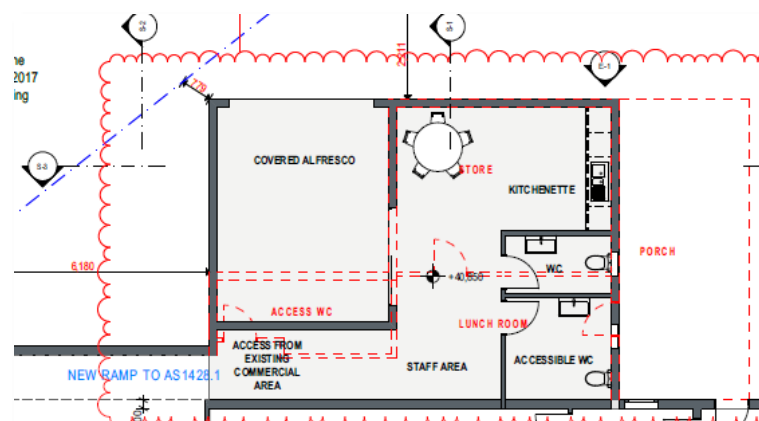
PROPOSED INTERNAL RECONFIGURATION
